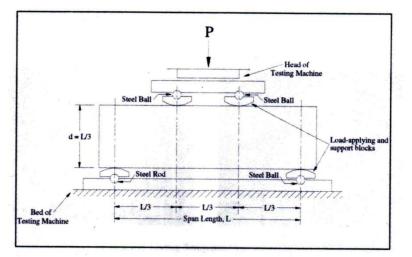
Flexural Test of Concrete by Four-Point Loading Method
